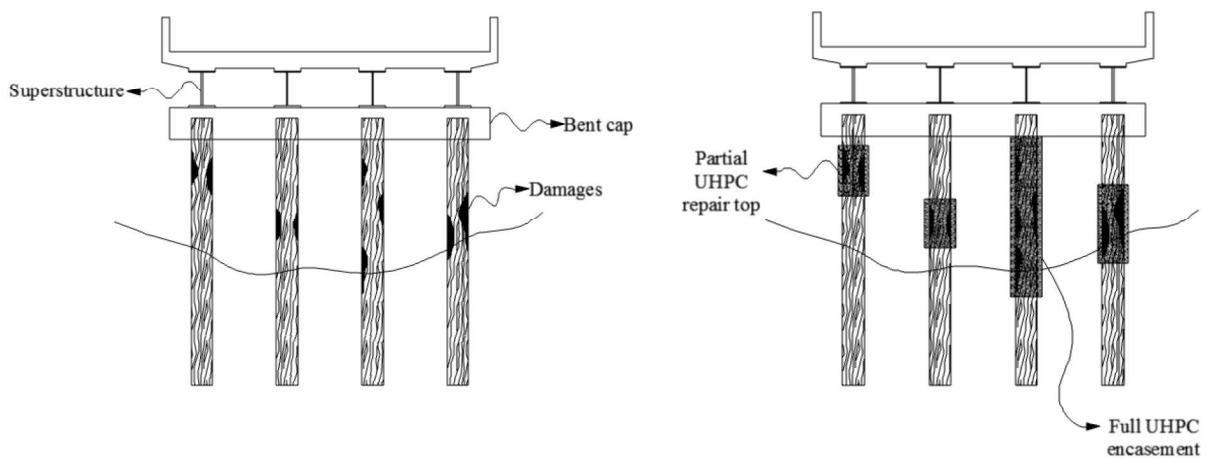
Common damages in timber piles (left) and proposed UHPC repair/retrofit (right).
